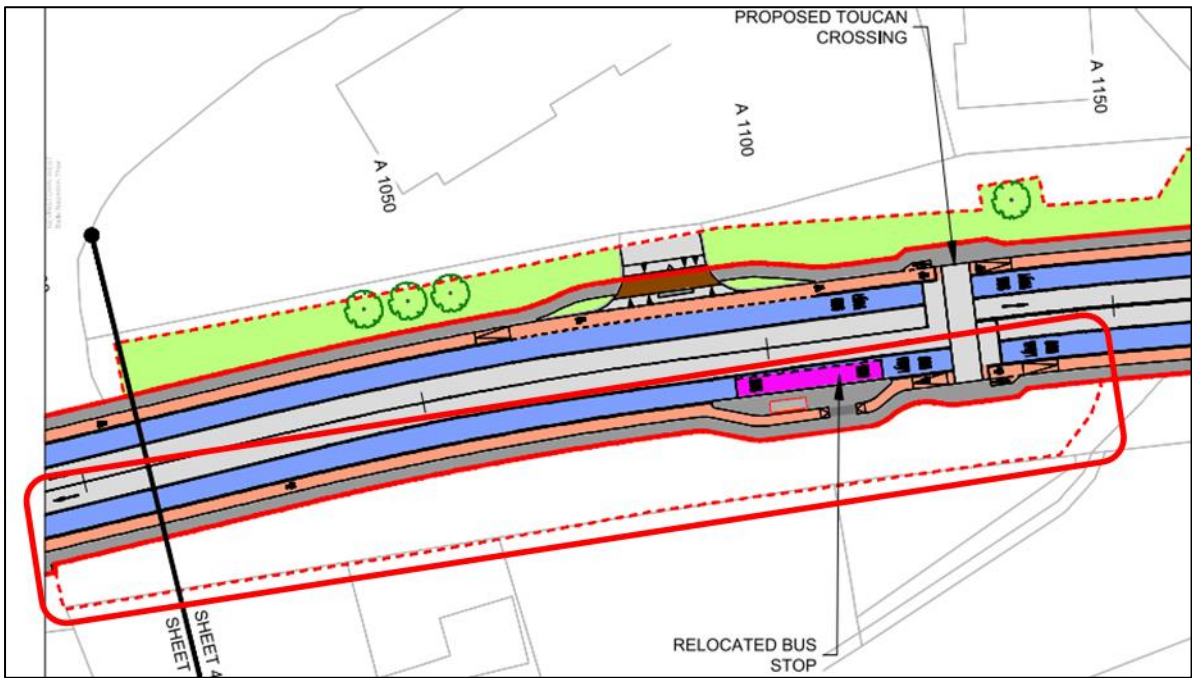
Proposed new Layout on the Swords Road (R132)
